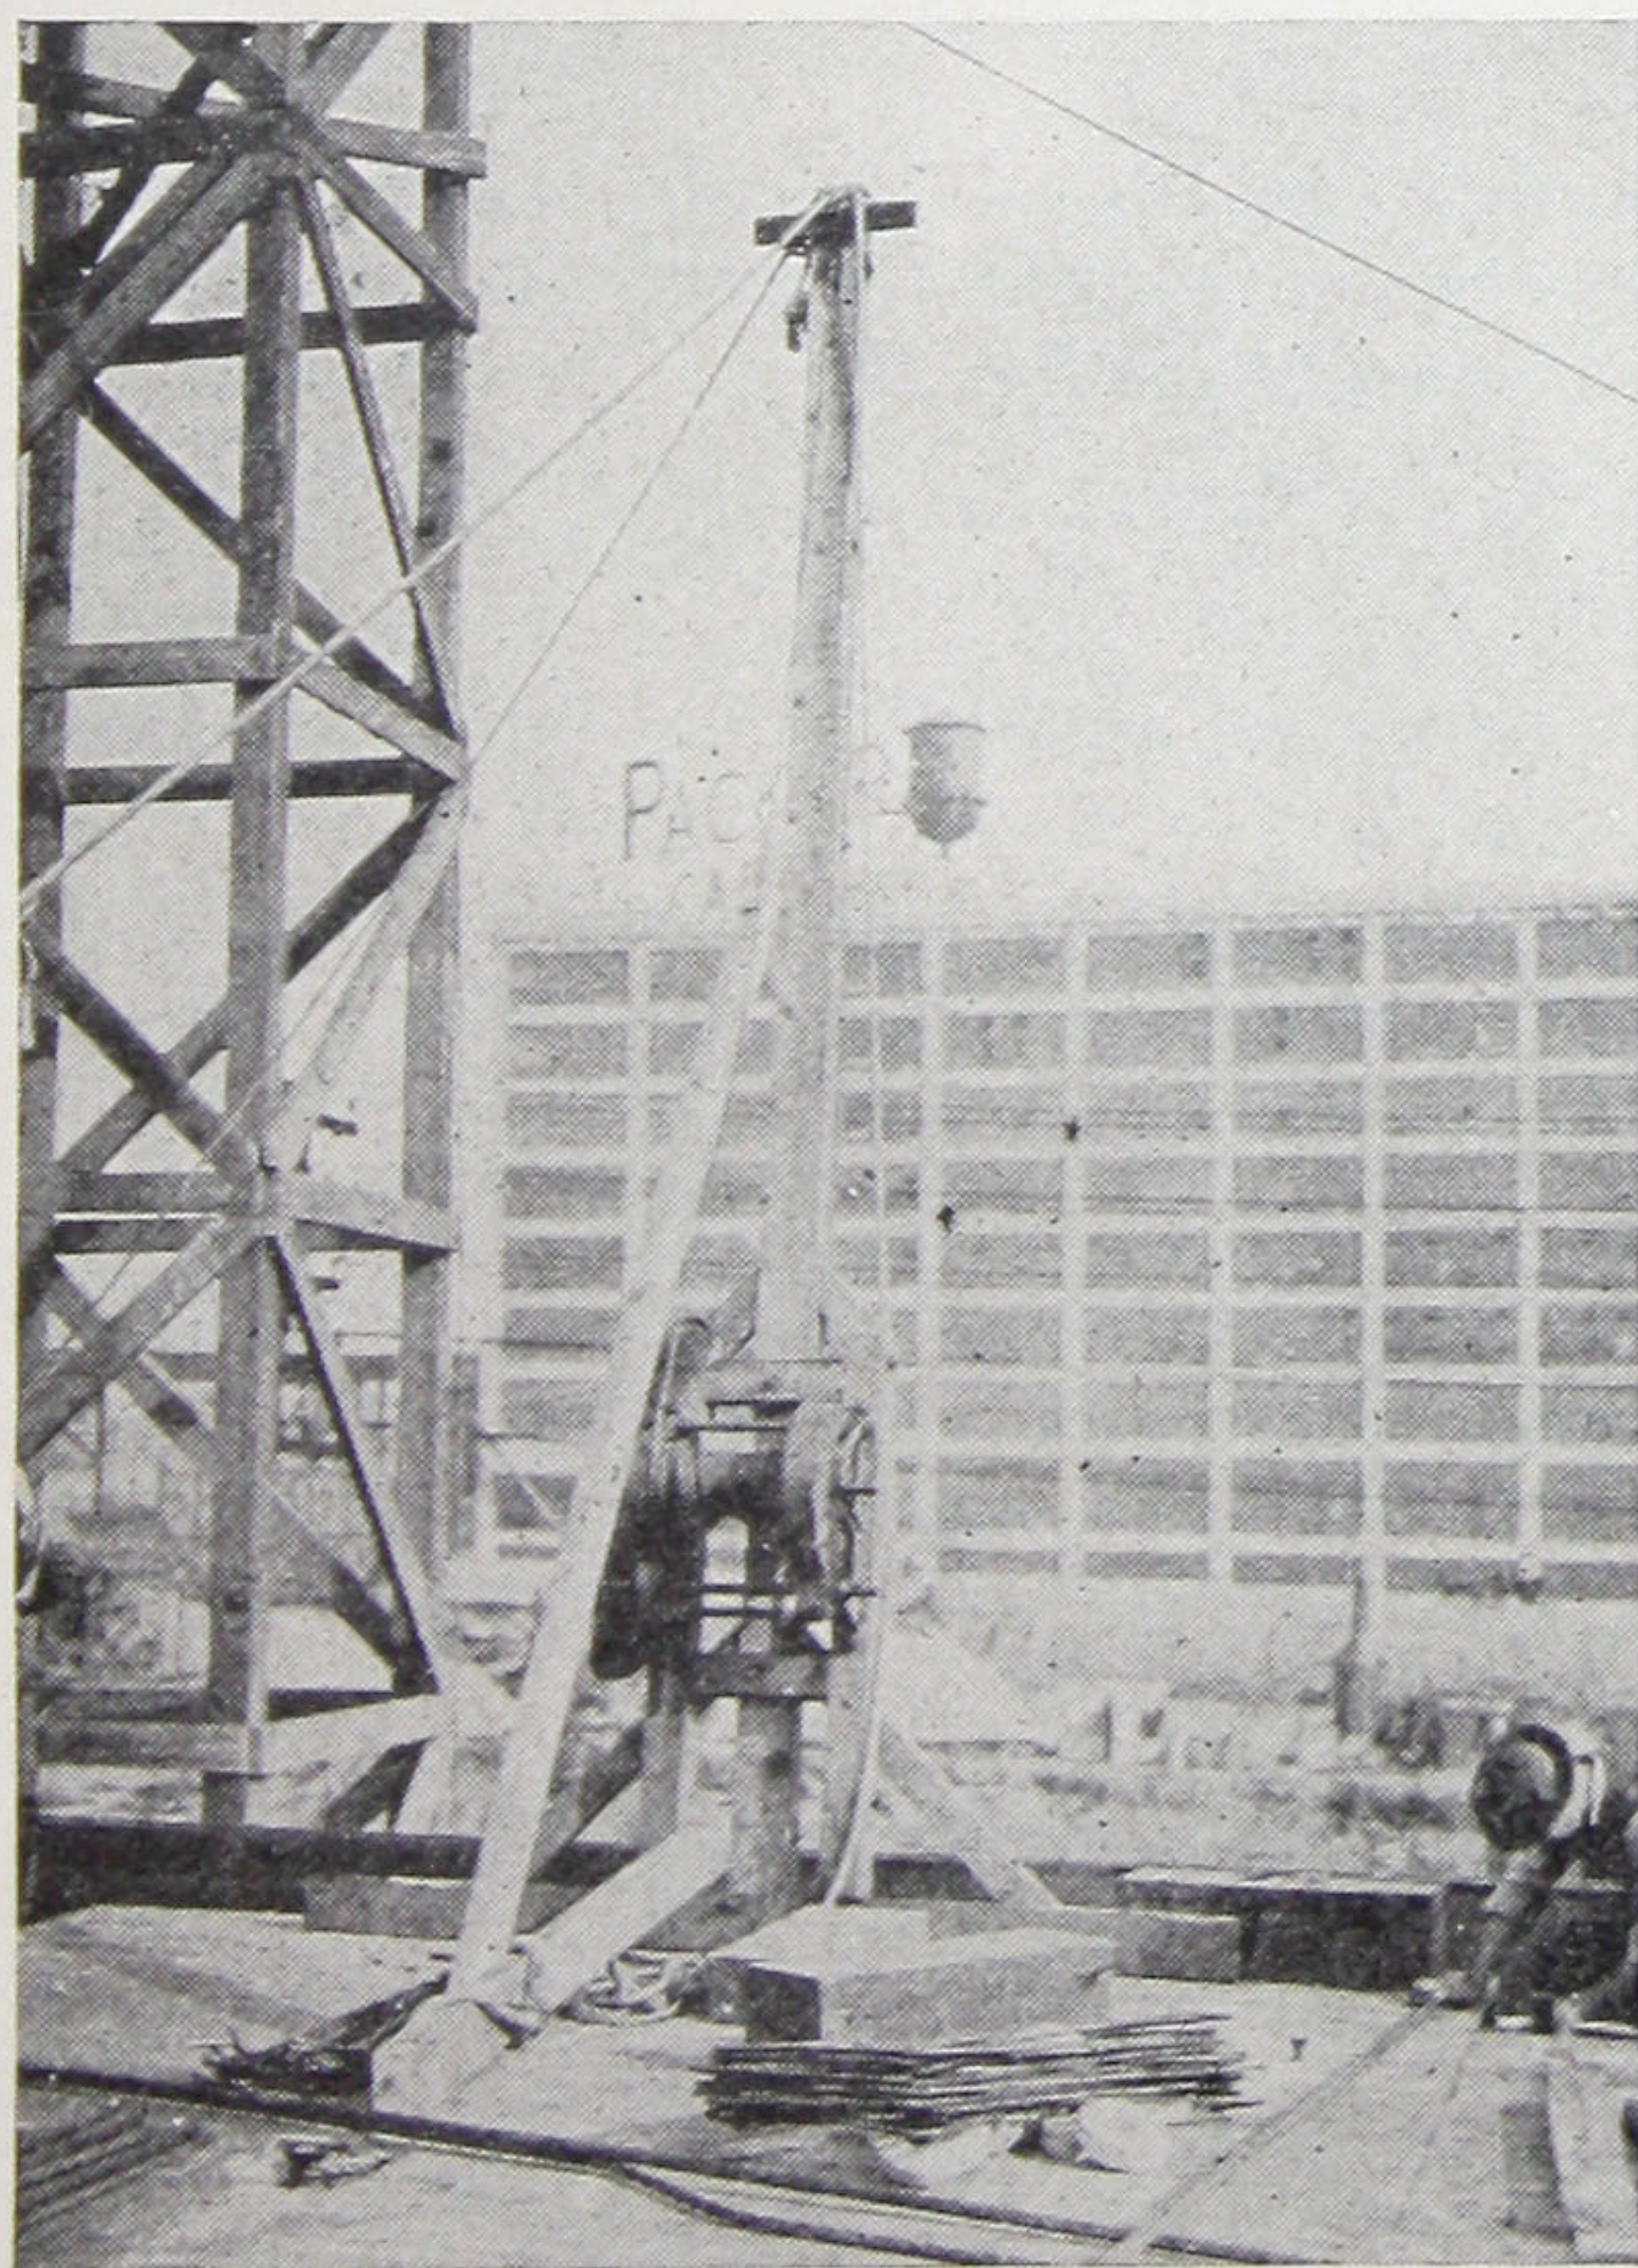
A "Jenny-Winch," by means of which light loads can be hoisted with a hand windlass.
